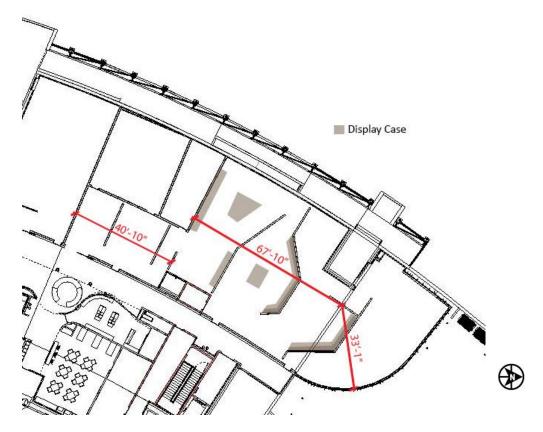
| Museum Plan: Dimensions and Furniture Plan
